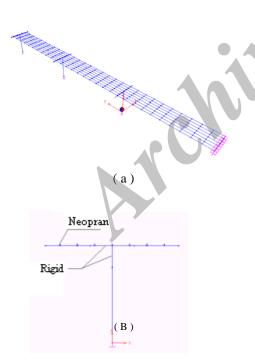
Continuous bridge models for R. S analysis a: Bridge model b: Pier detail
